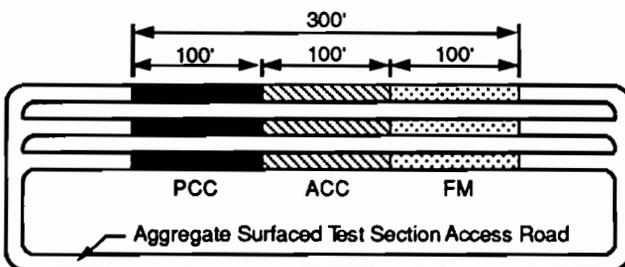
Layout of test site at Balcones Research Center (Ref 3).
